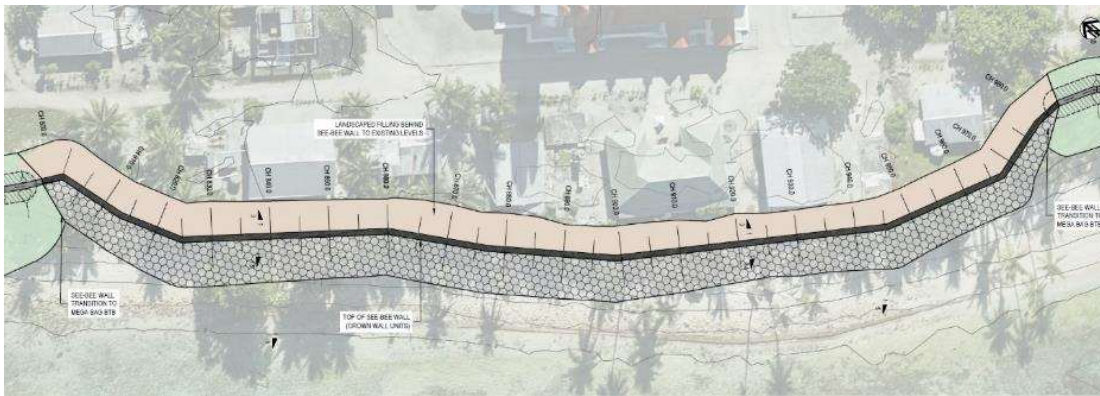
Design plan for Nanumea Seabee coastal revetment in front of church
